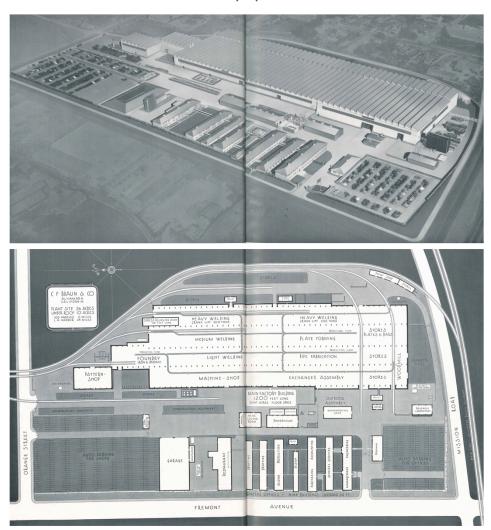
Rendering and site plan from CF Braun & Company, The Braun Plant, 1944.
